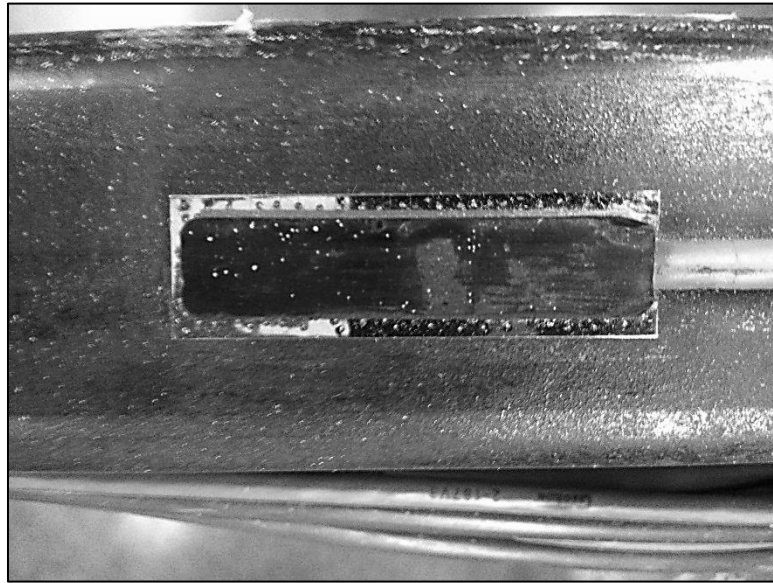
HiTec Weldable 2" Shim Length Strain Gage
